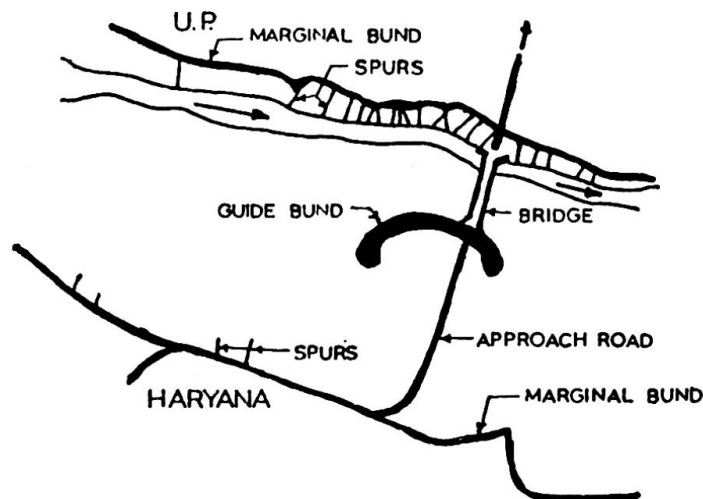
LAYOUT PLAN OF YAMUNA BRIDGE AT KARNAL
